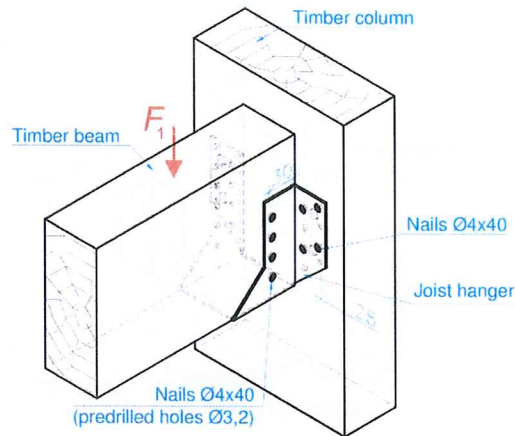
Typical installation of the joist hanger in the timber beam to timber column connections
